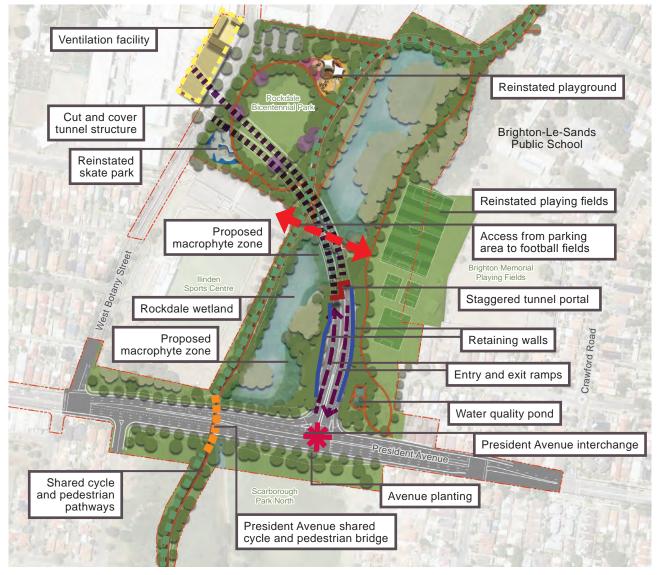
Plan of Bicentennial Park East playing fields showing possible end-state arrangement after construction works and consultation with stakeholders
